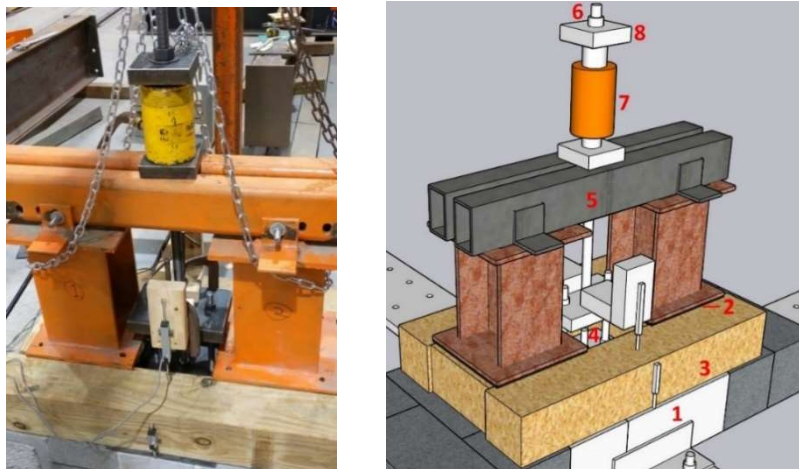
a) Anchor bolt pull-out test setup b) Anchor bolt pull-out test setup (SketchUp)
